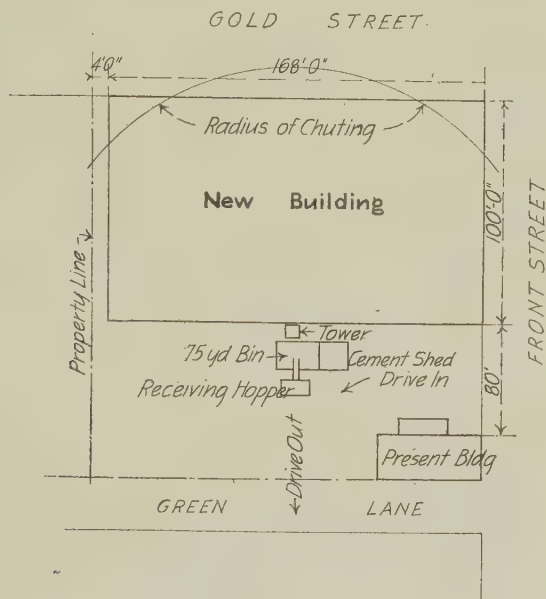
PLOT PLAN GARDINER LUCAS CO., BROOKLYN, N. Y.
